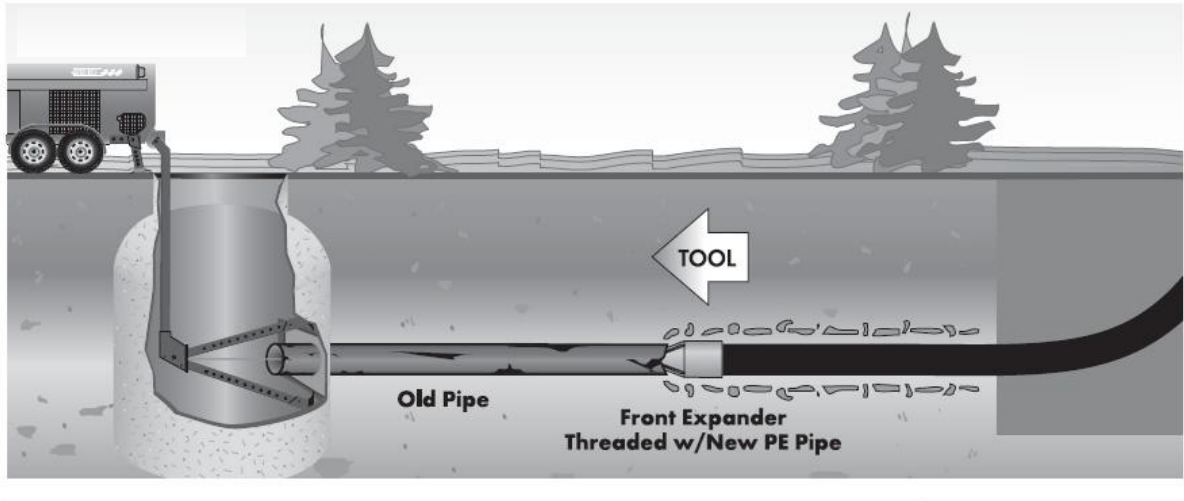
Typical Pipe Bursting with Winch and Exit Pit¹⁰⁹
